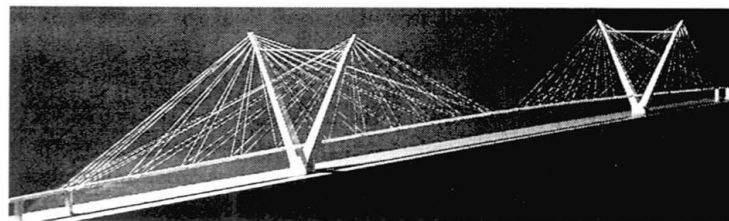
Architectural model of a cable-stayed bridge having a spatial cable system.
